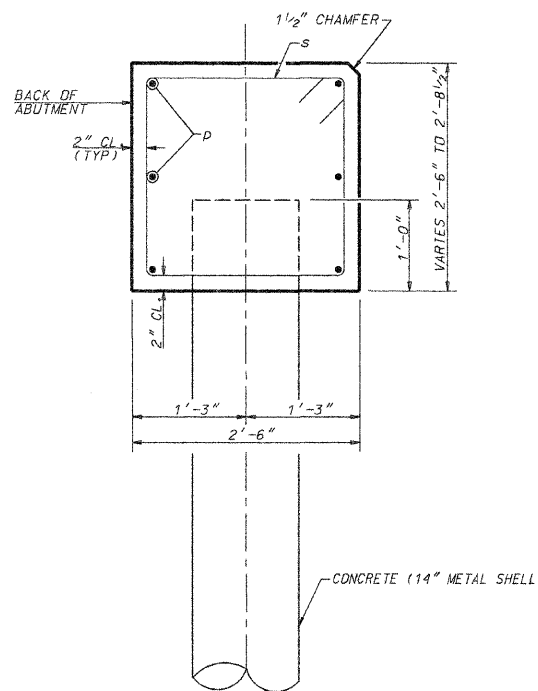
DETAIL OF CYLINDRICAL STEEL SHELL FOR CAST IN PLACE CONCRETE PILES
